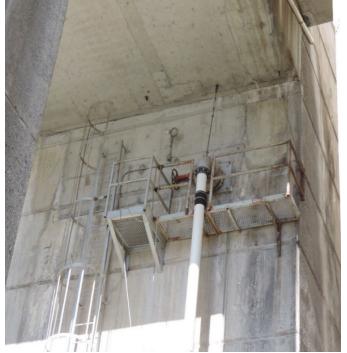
Closer View of the Existing Drain Valve for Diffuser 16.
